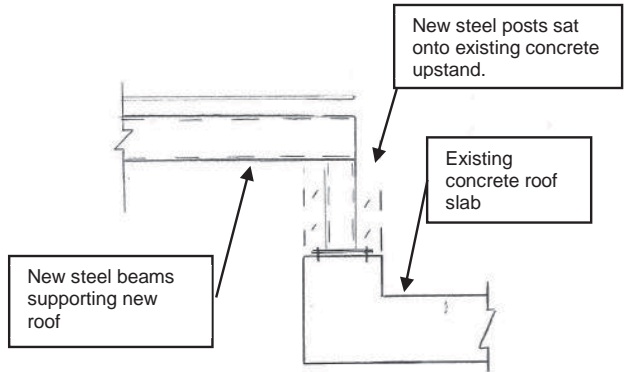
Extract of Sketch SK 007. Typical fixing detail onto roof parapet.
